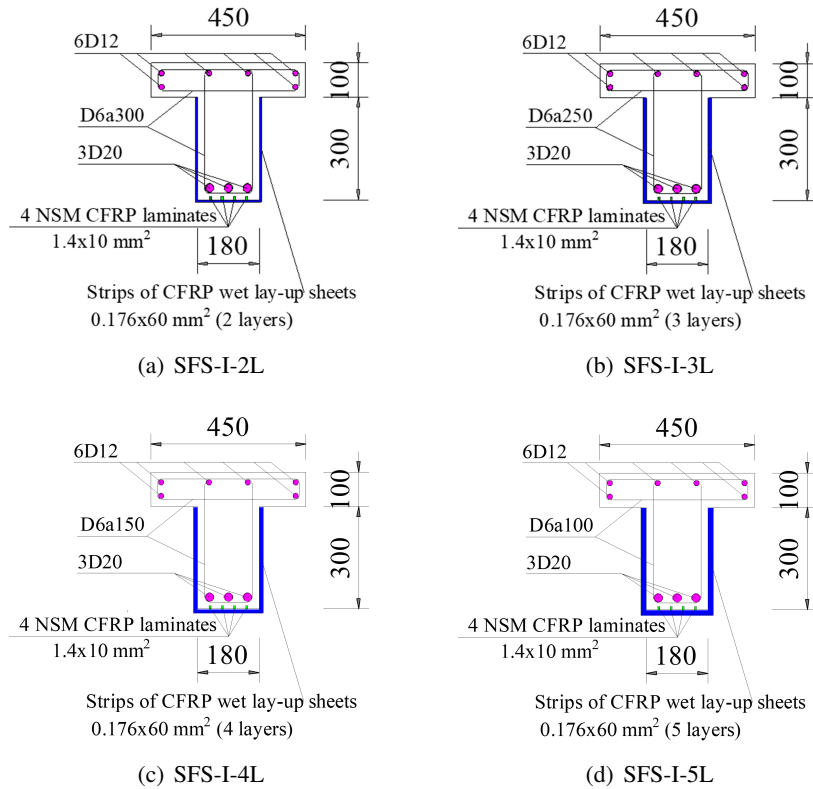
Cross-section of strengthened T-beams with multiple layers of U-wraps
